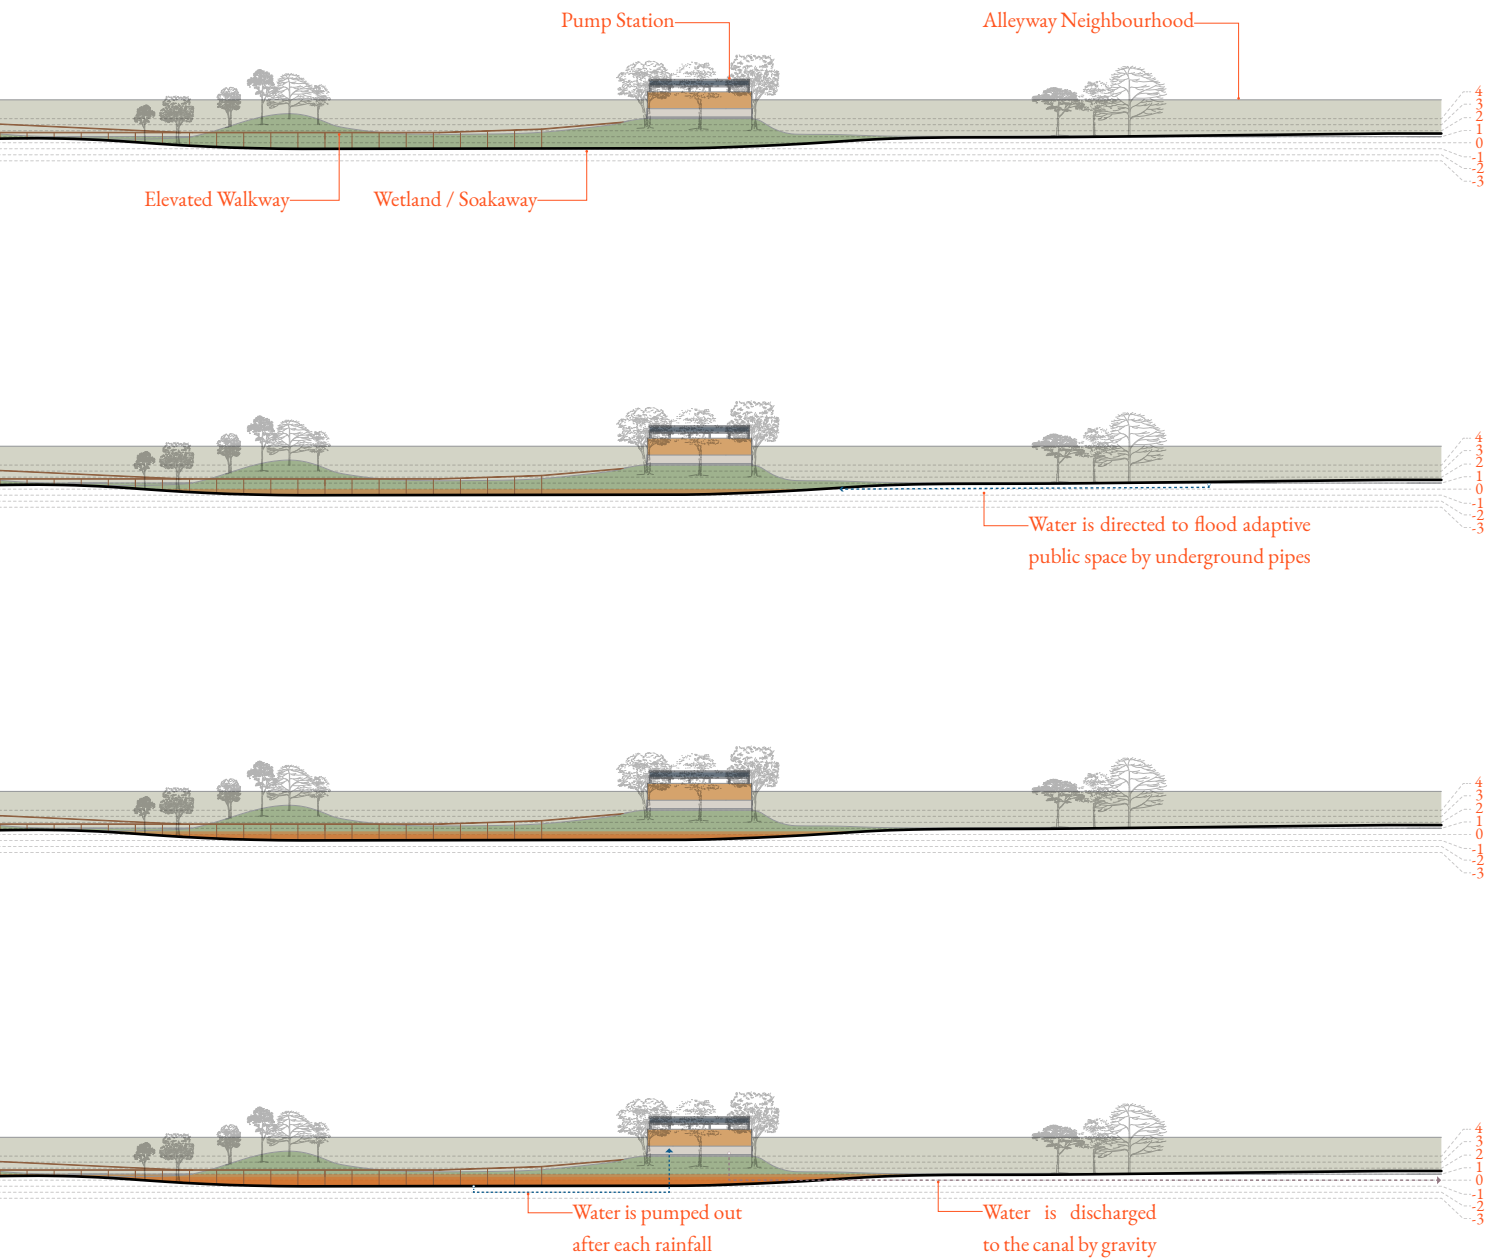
Walkway connecting to building on the hill (flood condition).
